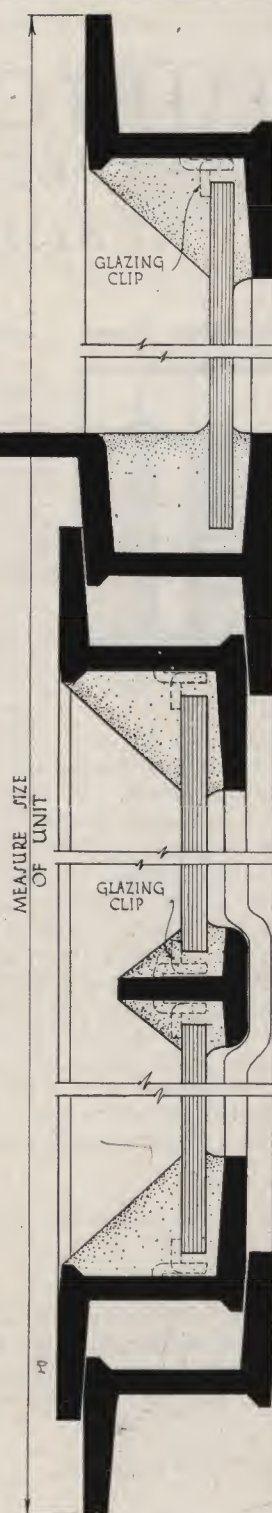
DETAIL · OF · RABBET · SHOWING CORRECT · DEPTH · TO · CLEAR · HINGE
